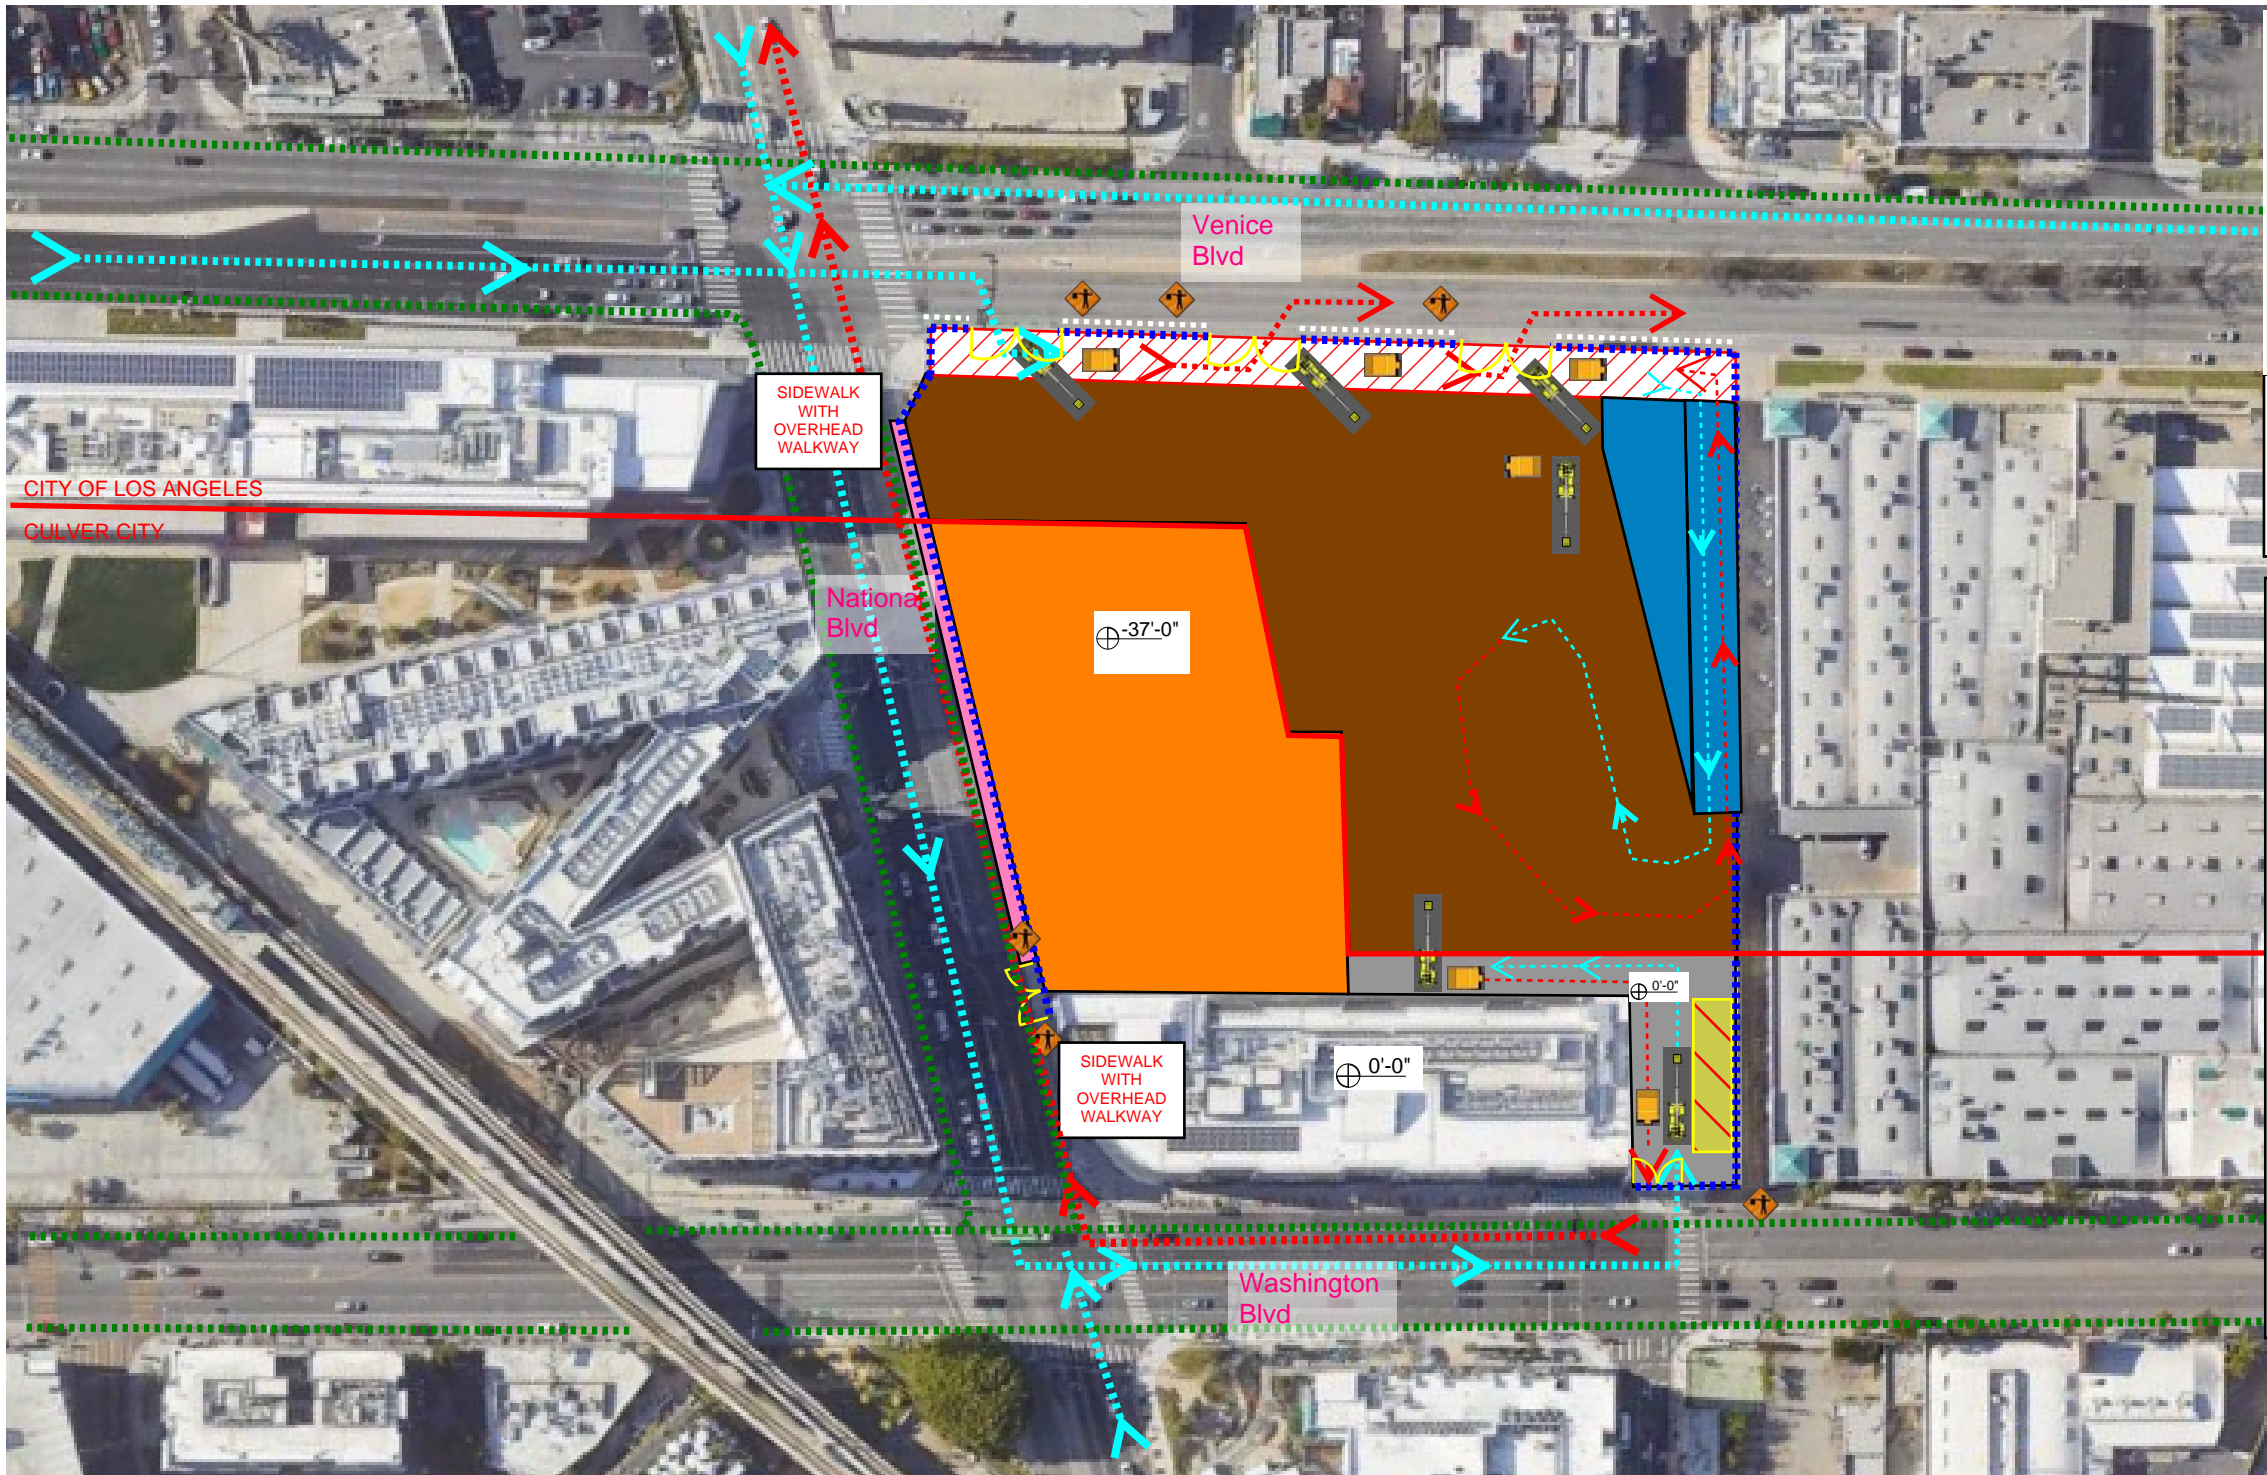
Phase 2 - Shoring : Fencing Plan, Site Access, Use of Public Streets and Sidewalk
